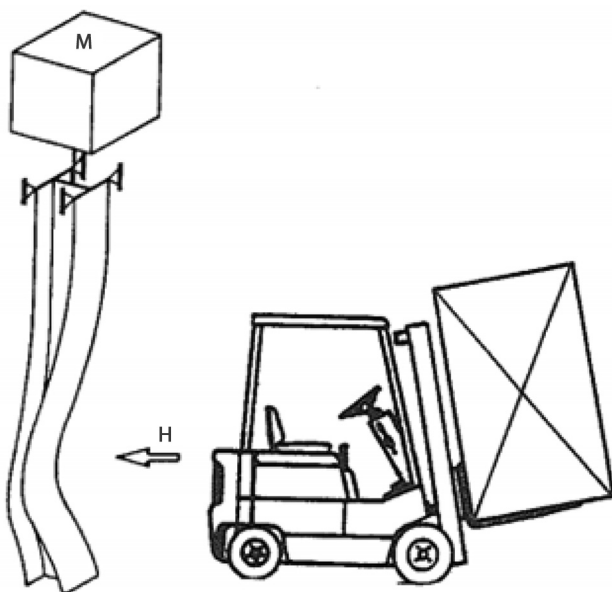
Impact load on a steel column by a fork lift (Hilpert nad Willnow, 1999).
